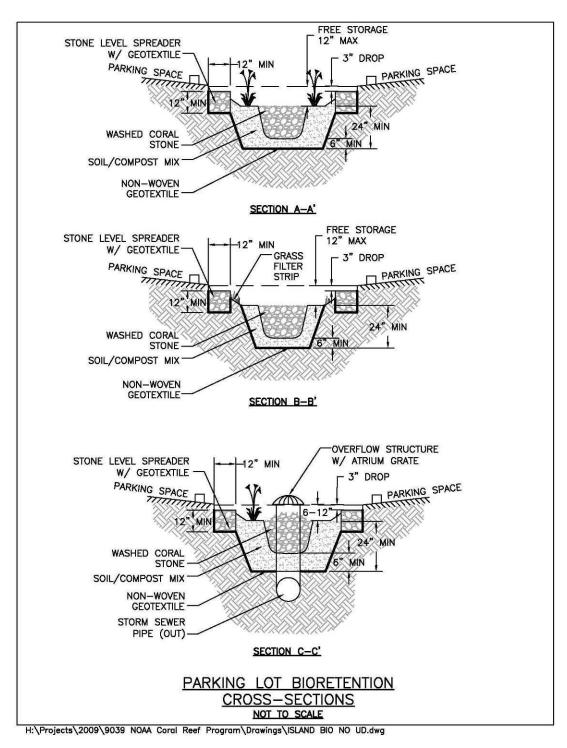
Cross-sections for <u>infiltration</u> design version (no underdrain). See Figure S2.3 (top) for location of cross-sections.
